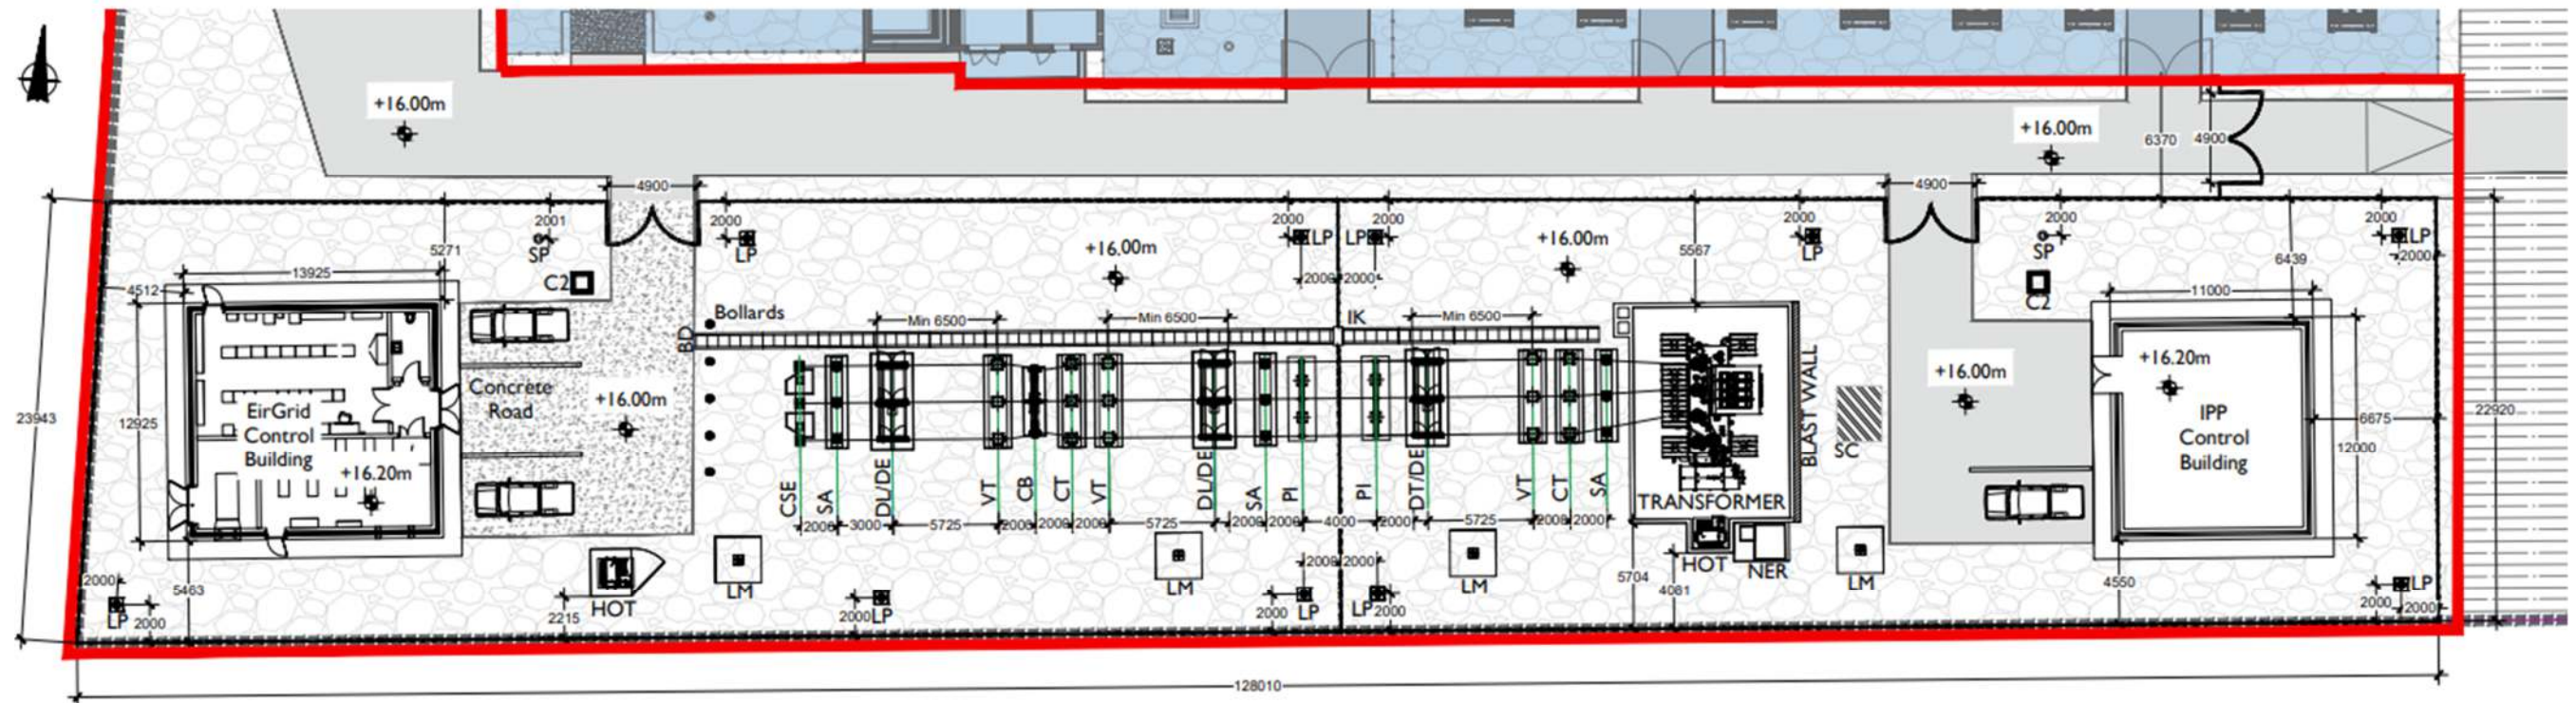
Proposed Substation Compound Layout Plan (From TLI Group Drawing Ref. 05951-DR-701 28.11.2023)
